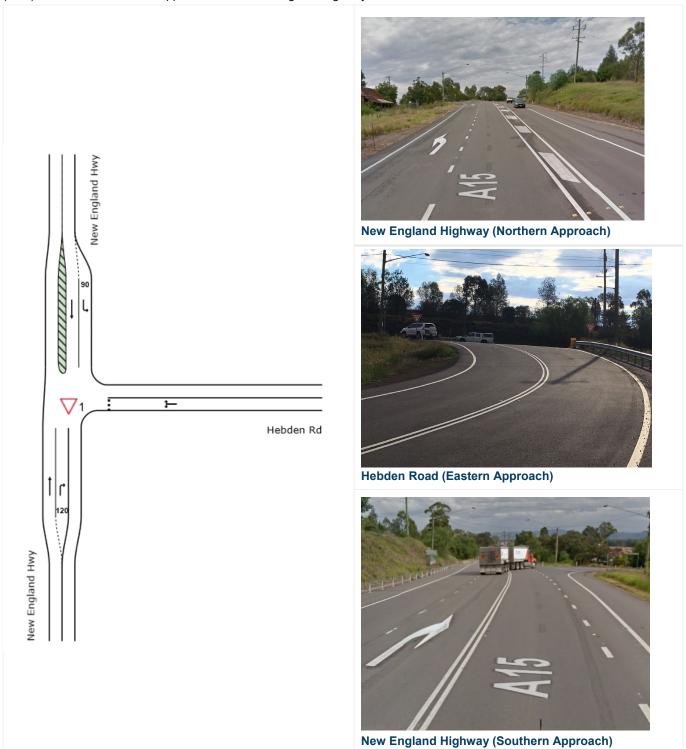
New England Highway / Hebden Road Intersection Layout
